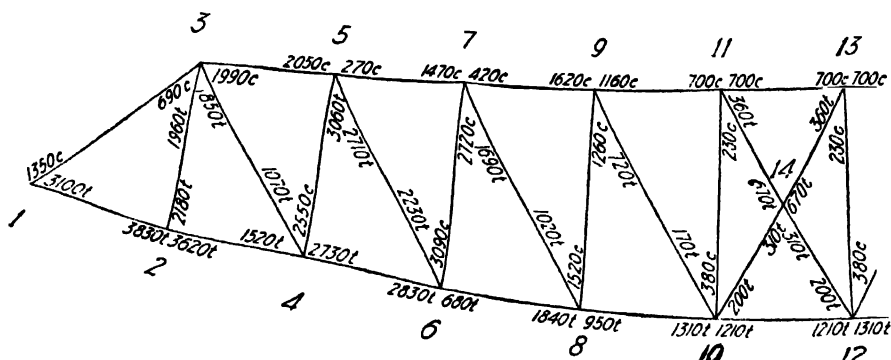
Secondary-stress Diagram of a 296-foot, Single-track-railway, Riveted, Parker-truss Span.
